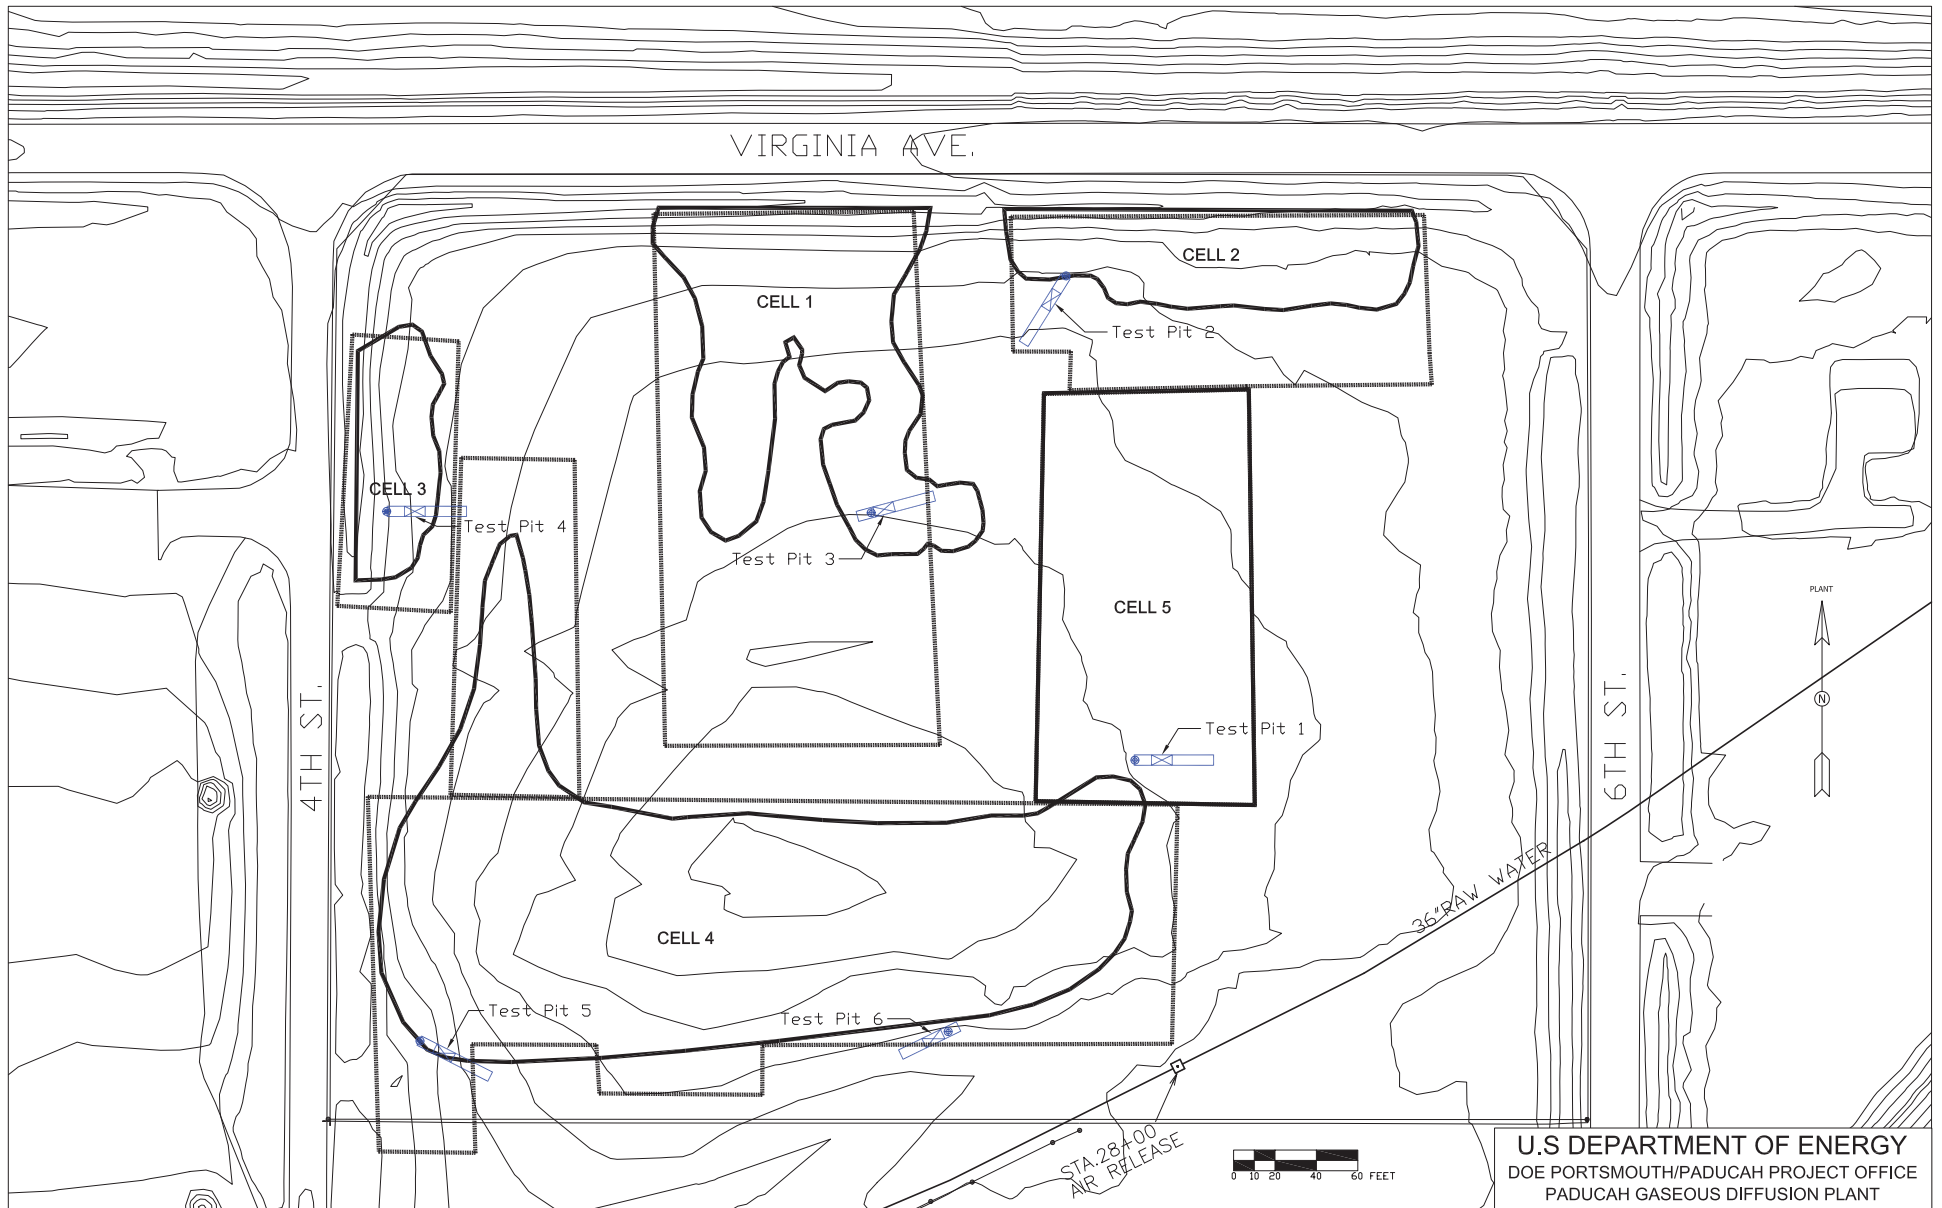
SWMU 4 Test Pit Excavation Plan
